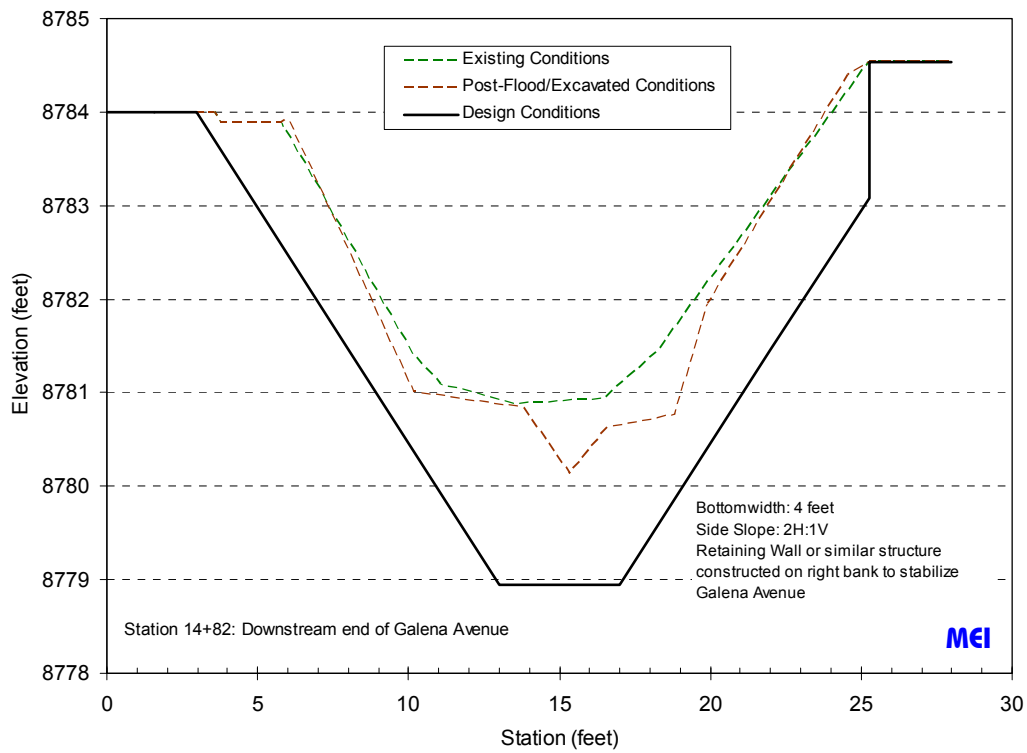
Cross-sectional schematic showing existing and post-flood/excavated conditions channel and channel design template at Sta 14+82.
